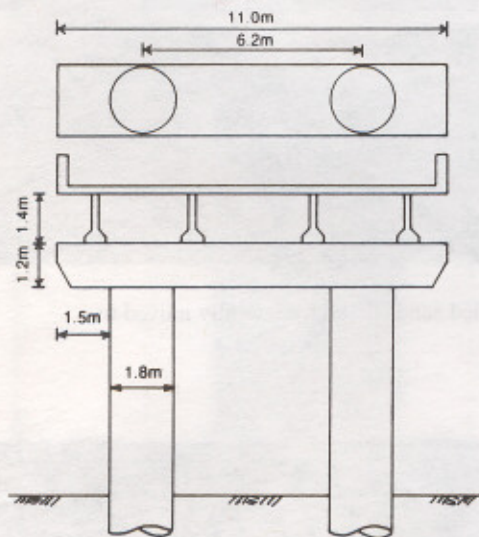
Details of the Bala-Bala bridge and its foundation piers.
